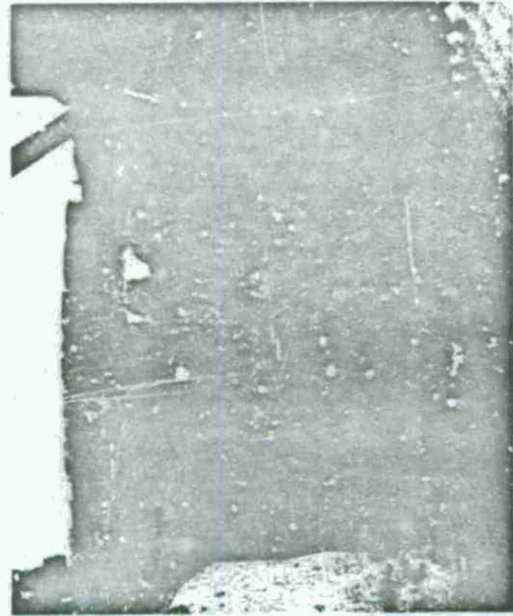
Damaged Headwall Inside Igloo A, West of Door Opening.
